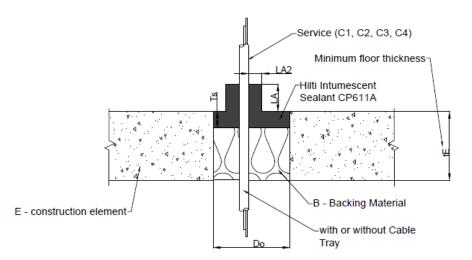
Side View, seal type 17, small cables ≤ 16mm and cable bundles ≤ 16mm, in concrete floor ≥ 150mm
